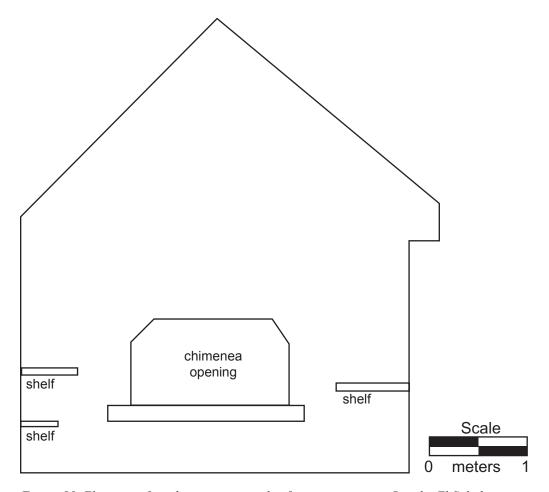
Elevation of northwest interior side of stone structure at Rancho El Saladito.
